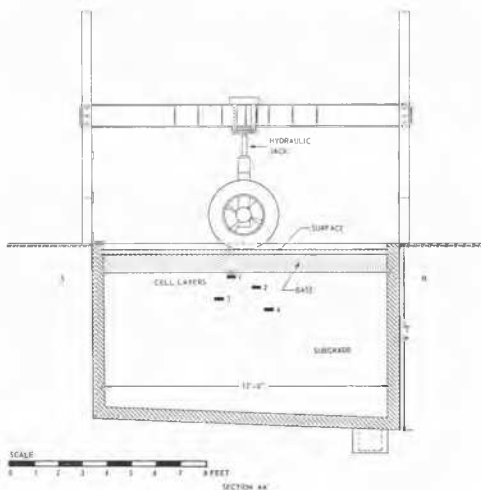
Cross-section of the test pit showing position of layers of pressure cells and the loading equipment.
